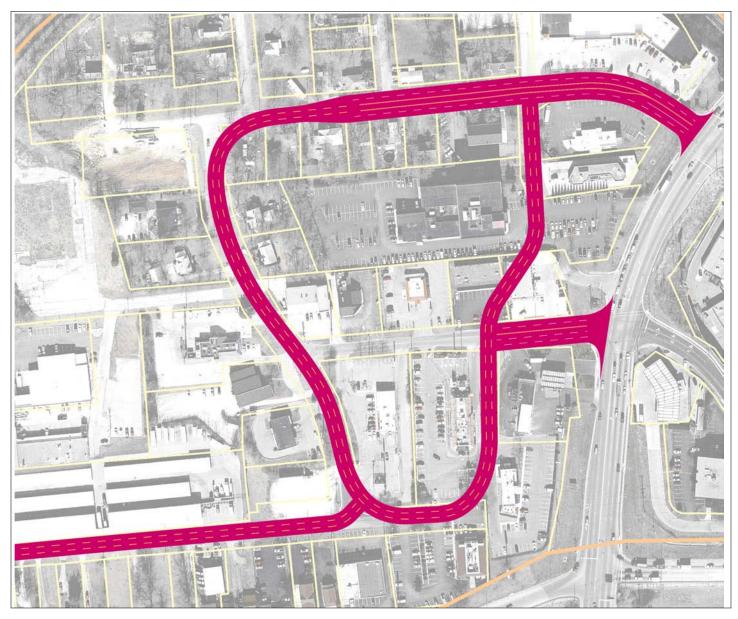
Concept drawing showing recommended road configuration in Sub Area A
